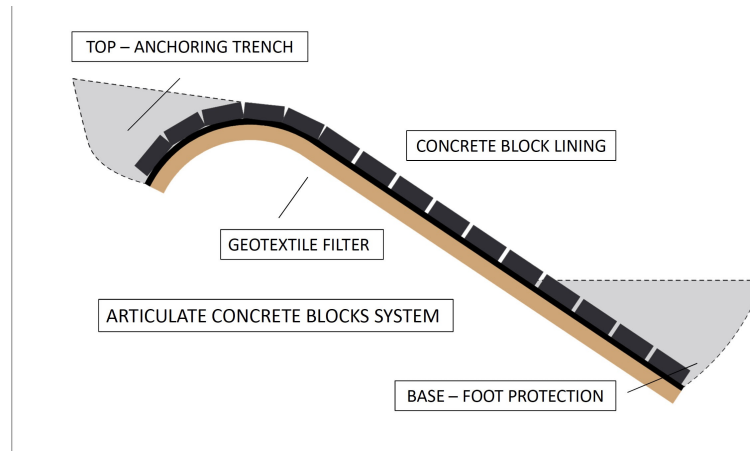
Example of an articulated concrete block system. Source: URCA-PROURB - FAU-UFRJ, 2020.
